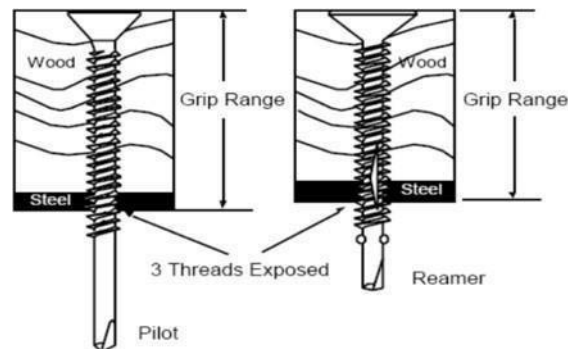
Source: CFSEI's Technical Note on Cold-Formed Steel Construction — Screw Fastener Selection for Cold-Formed Steel Frame Construction, F102-11, Nov. 2011.
